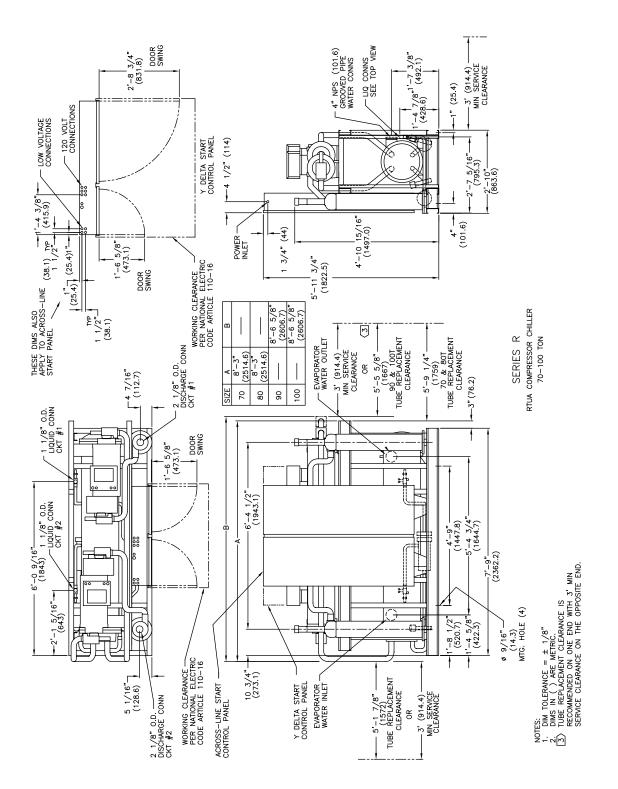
Dimension and Clearances for RTUA Compressor Chiller – 70-100 Tons
